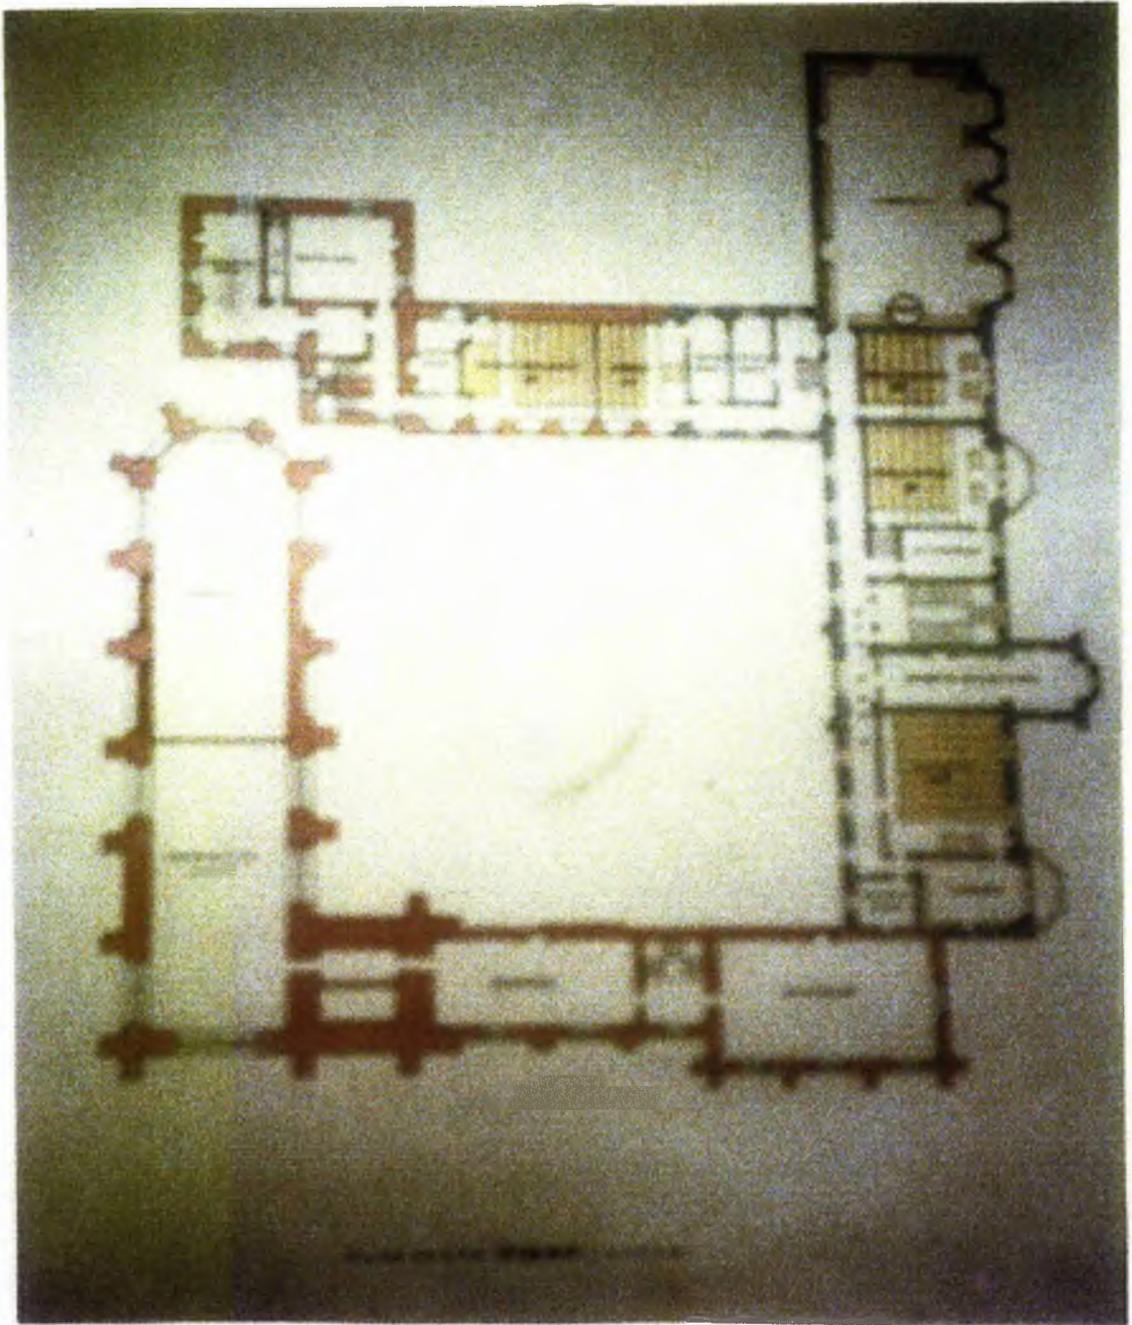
King's College. Ground floor plan of alterations and additions approved by the Senate. R. Matheson August, 1855.
